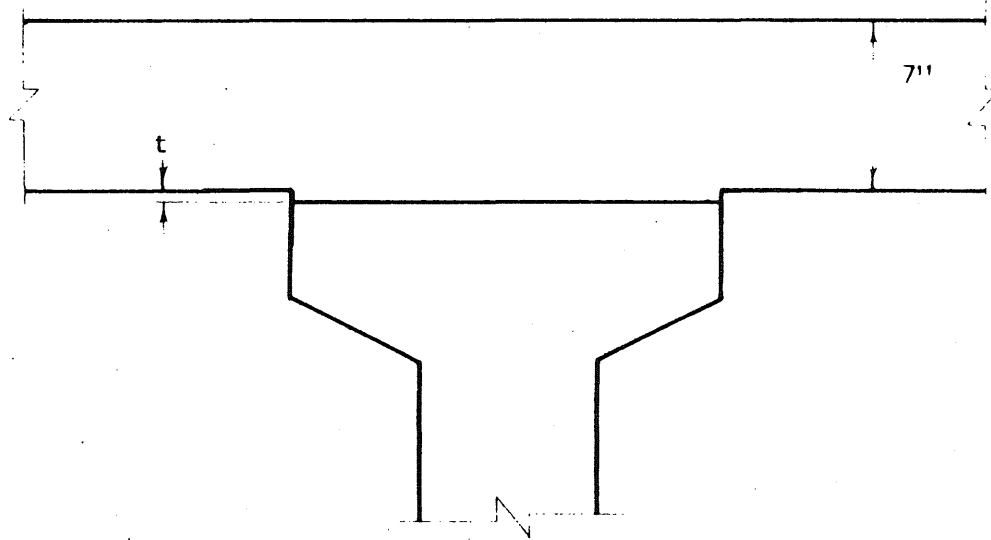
BRIDGE CROSS-SECTION NEAR MIDSPAN
